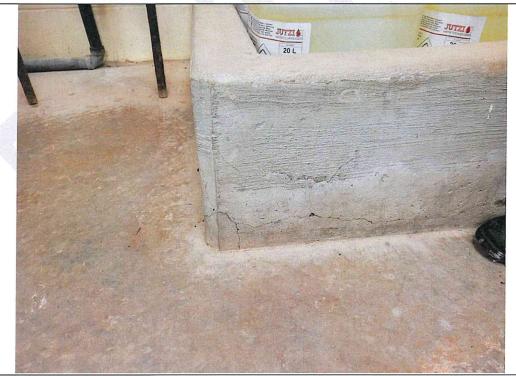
The Containment Curb is Cracked. Wall is Approx. 100mm Thick
